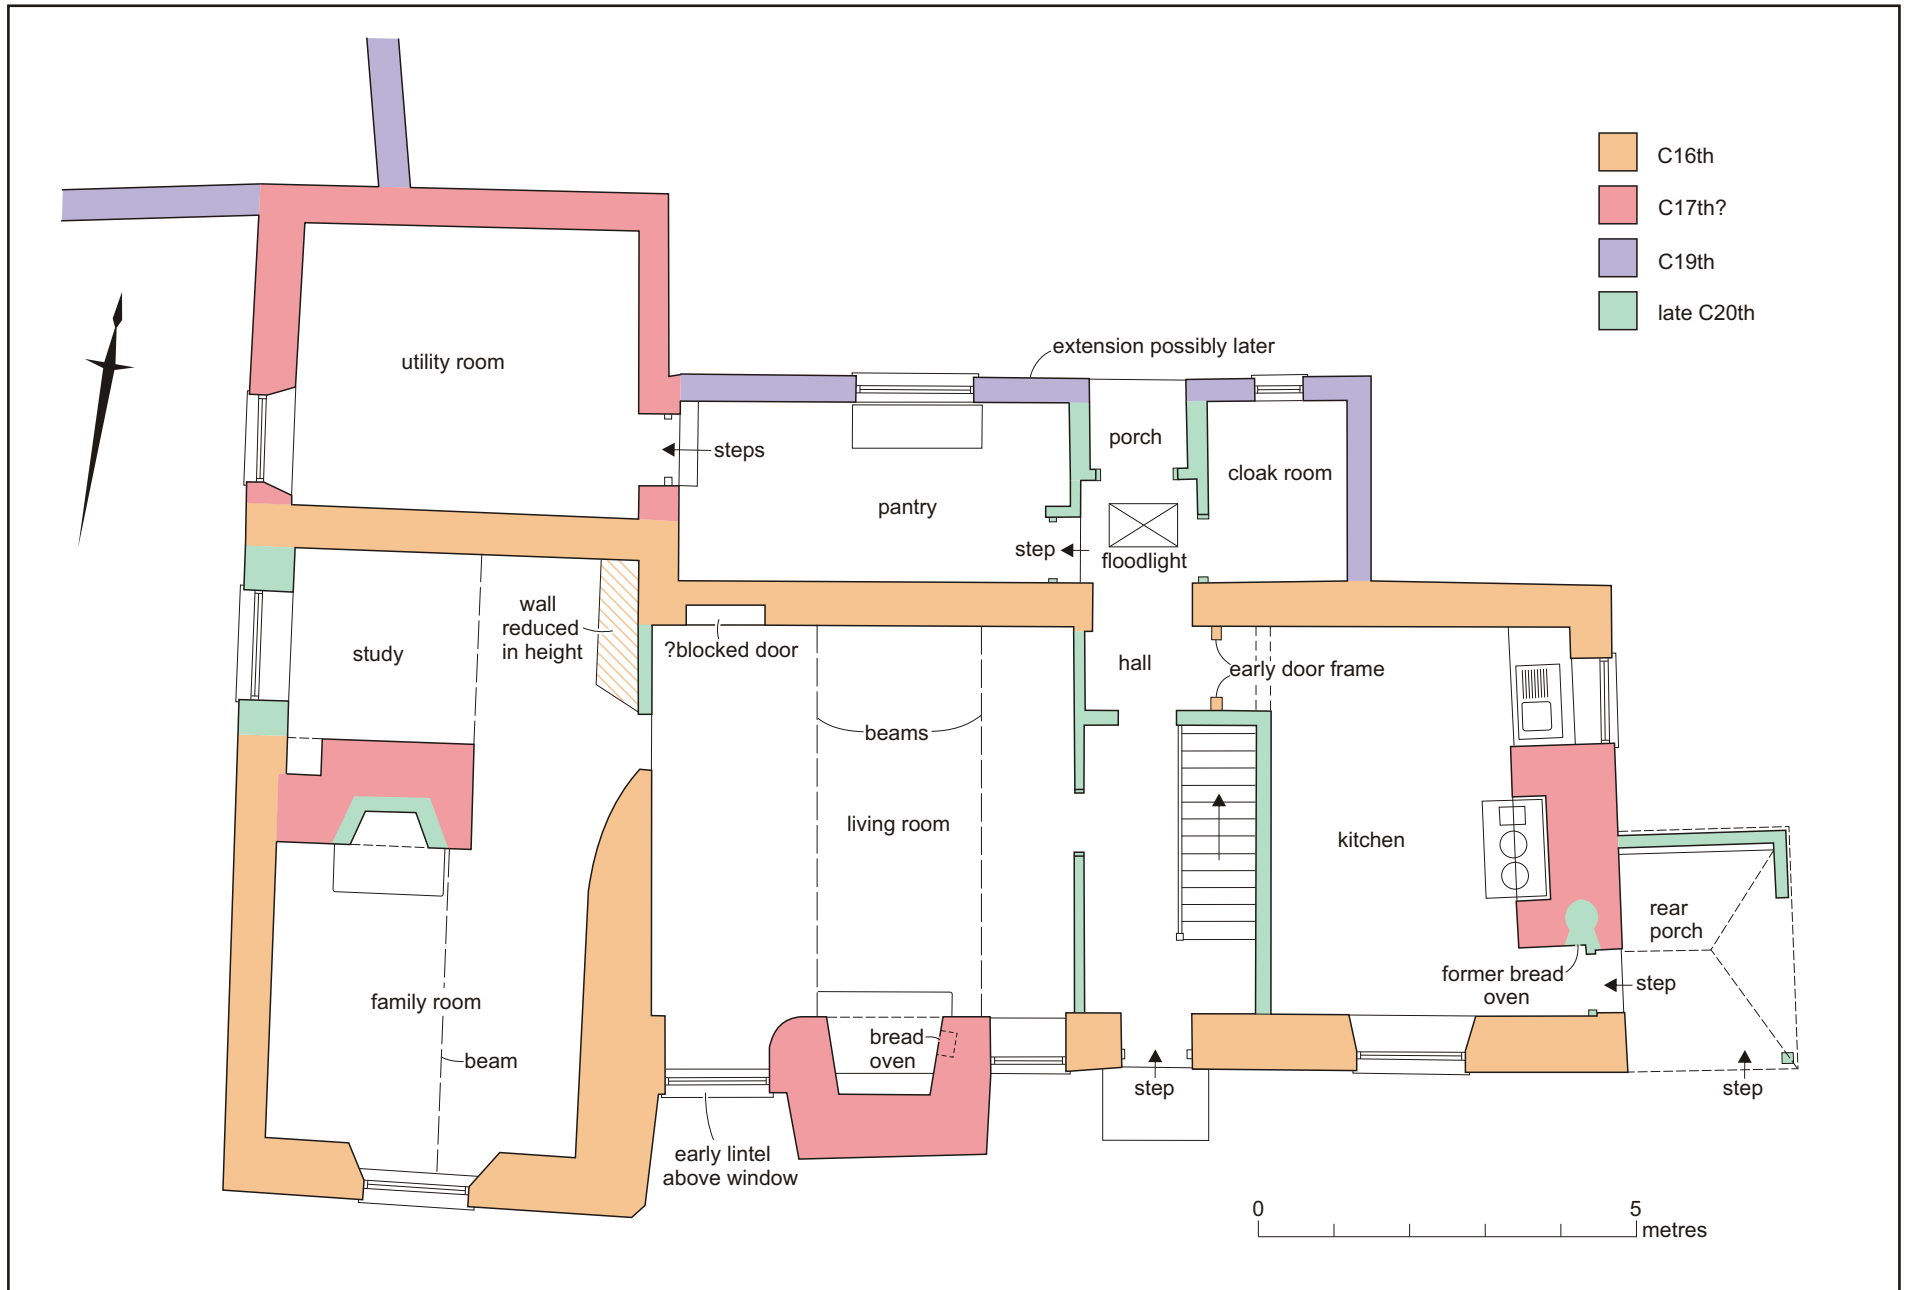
East Densham Farmhouse, ground floor phase plan. Scale 1:100.
